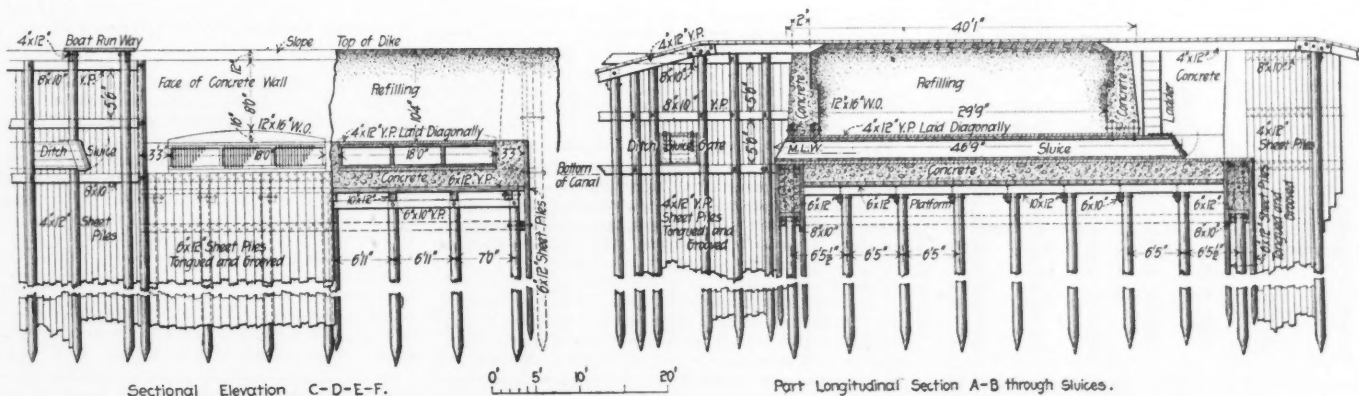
TRANSVERSE AND LONGITUDINAL SECTIONS, SHOWING TIDE GATE CONSTRUCTION, SWANSON ST. CANAL.
